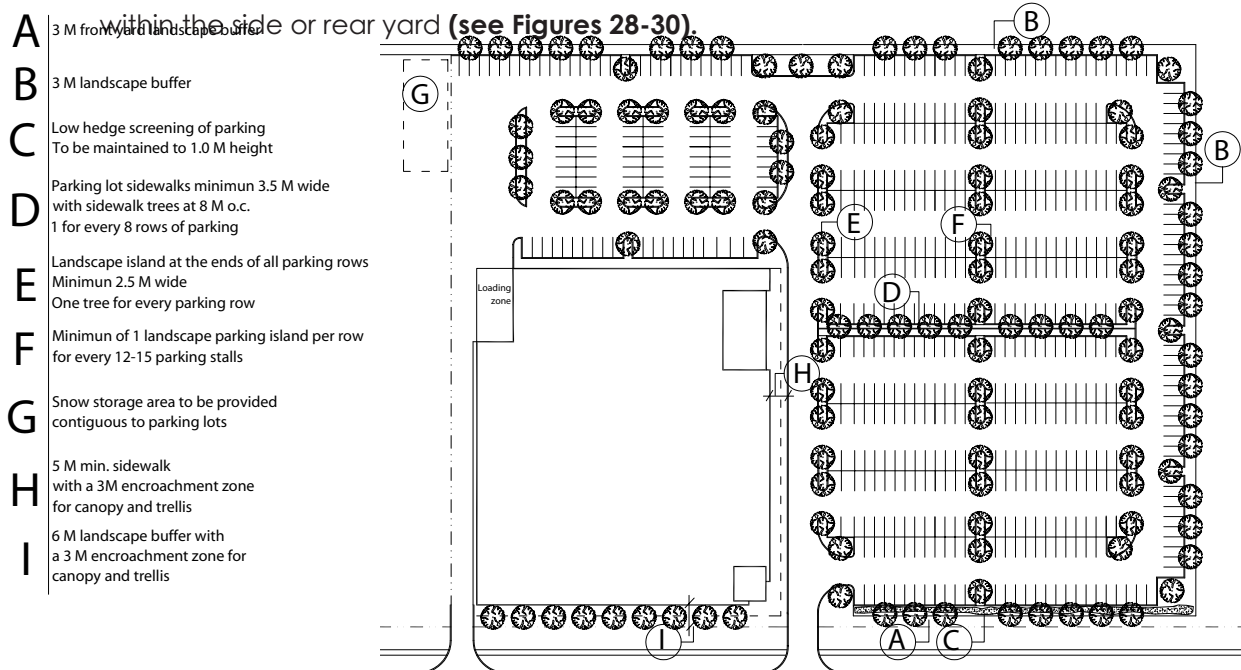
Landscaping should be used to define smaller parking areas and site edges.
